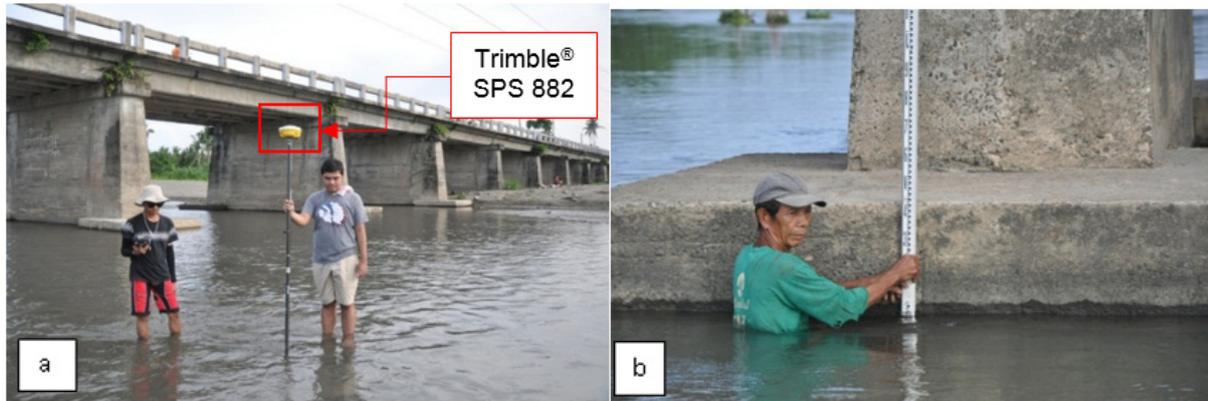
(a) Bridge cross-section and (b) As-Built Surveys at Daguitan Bridge, Dulag, Leyte
